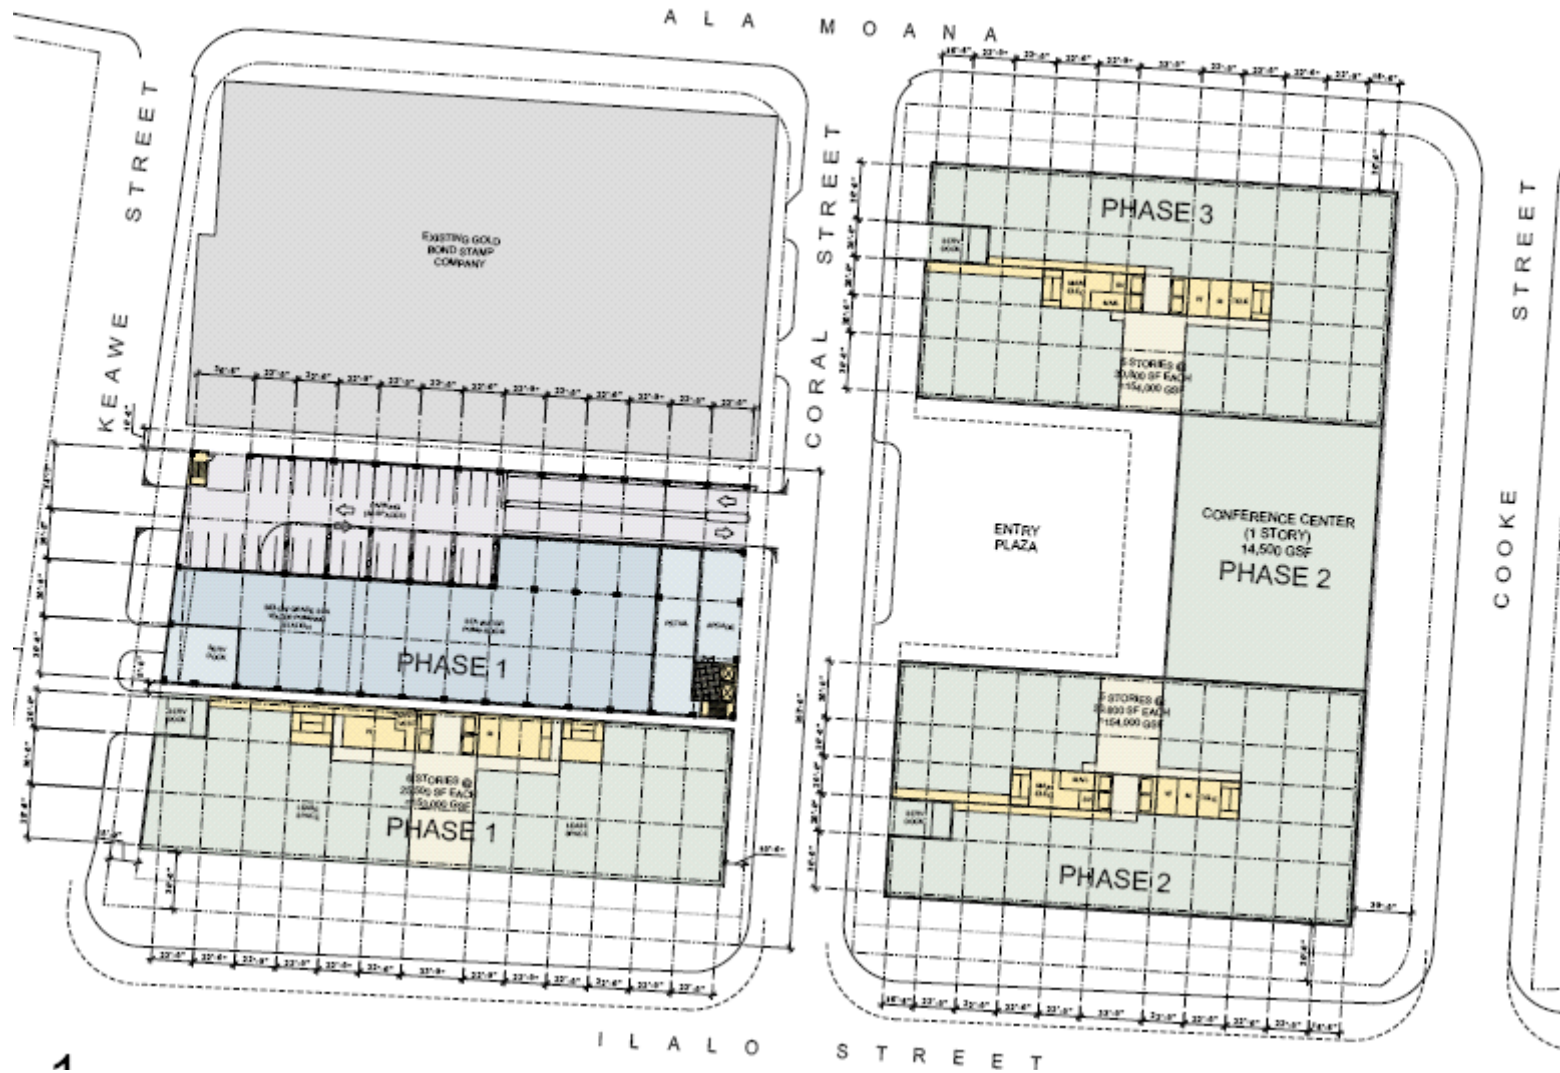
Floor Plan of Potential Total Development at Preferred Site
